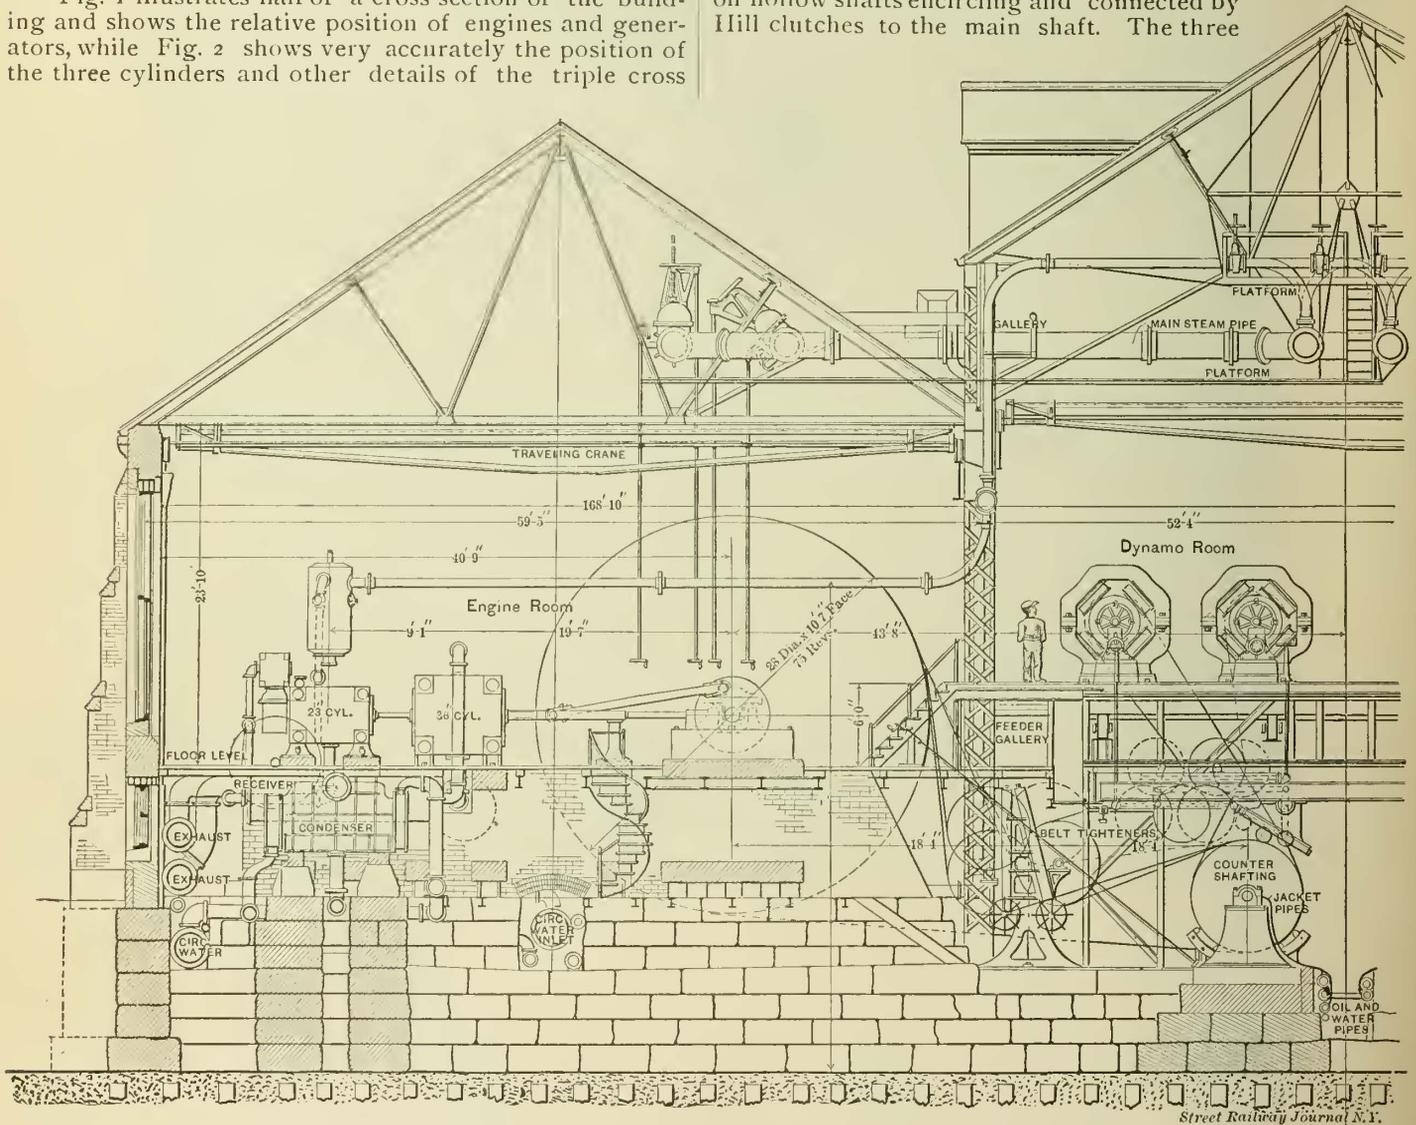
HALF CROSS SECTION, CENTRAL POWER STATION—WEST END STREET RAILWAY.
